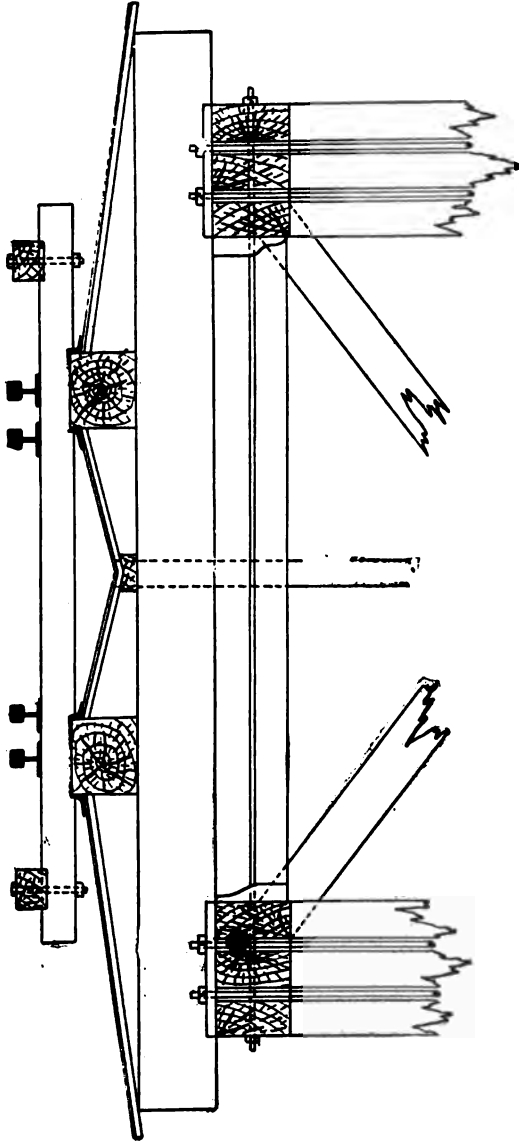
PLAN OF COVERING FOR A DECK TRUSS BRIDGE. RECOMMENDED BY MR. JOHN FOREMAN, PHILA-DELPHIA AND READING R. R.
